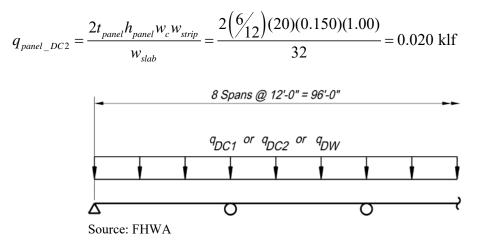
Illustration. Locations of applied concrete slab dead loads.
